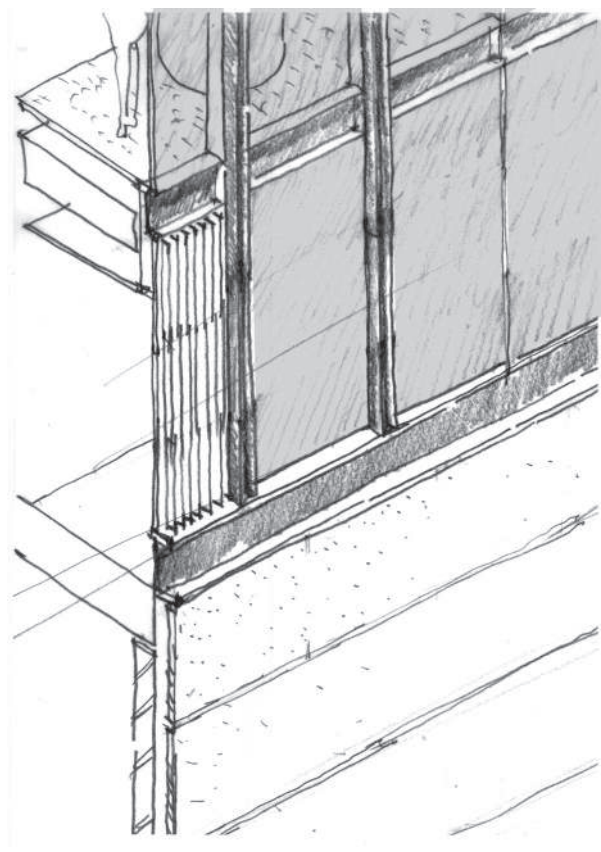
Detail of vertical fins applied to tower glazing and louvre banks at podium levels
